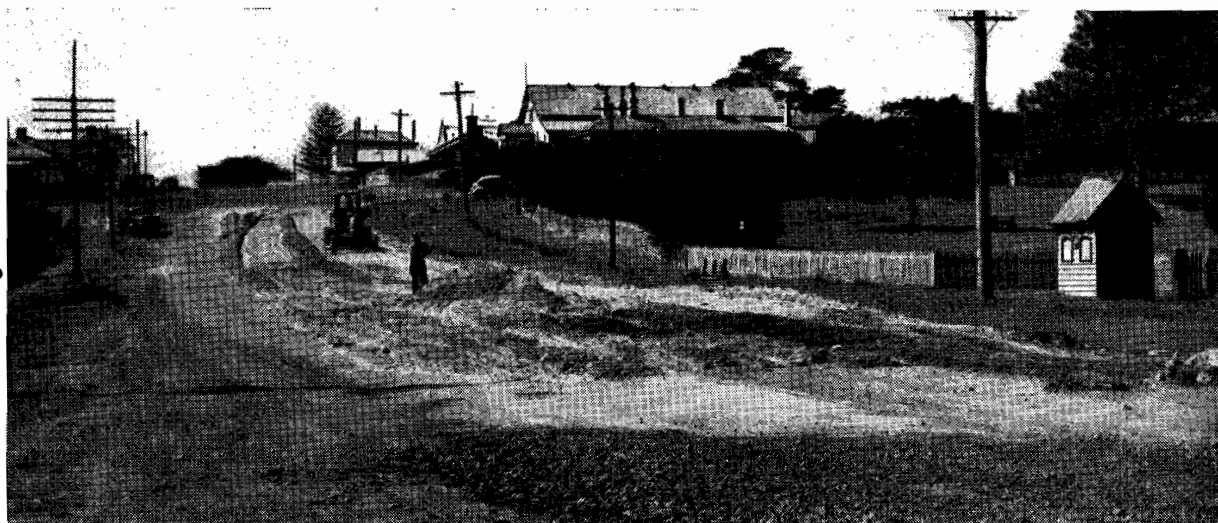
Bentinck Street, Portland. Reconstruction and sealing of weak and worn out sections.
